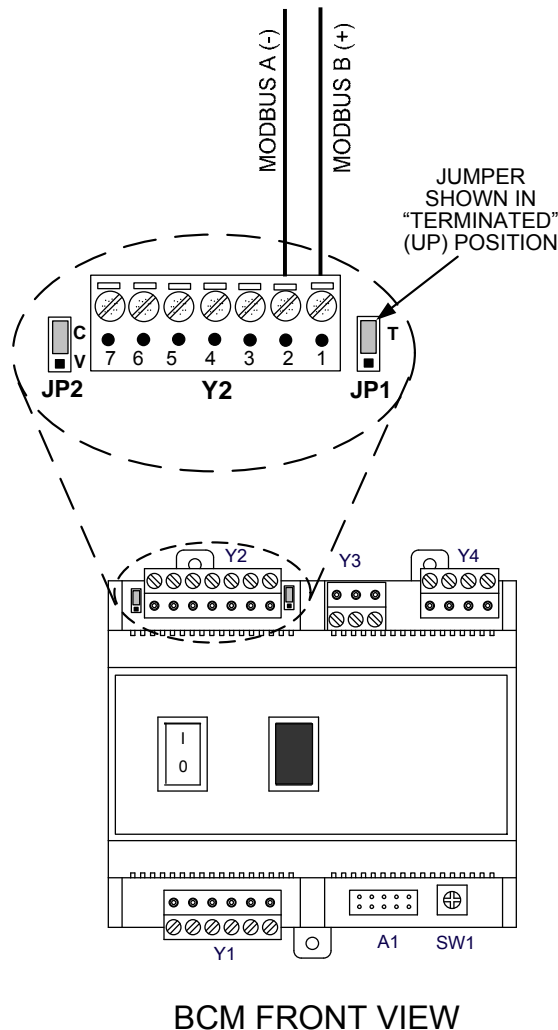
RS485 (Modbus) Wiring For Modulex Series Boilers
